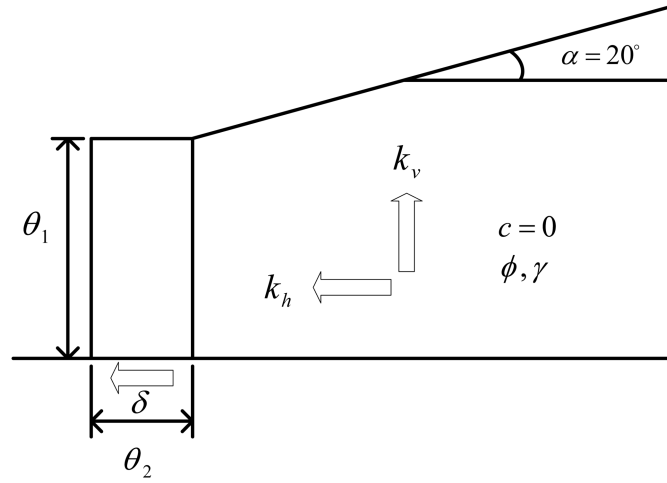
The cross section of the retaining wall. θ_1 and θ_2 are the height and width of the retaining wall, respectively
